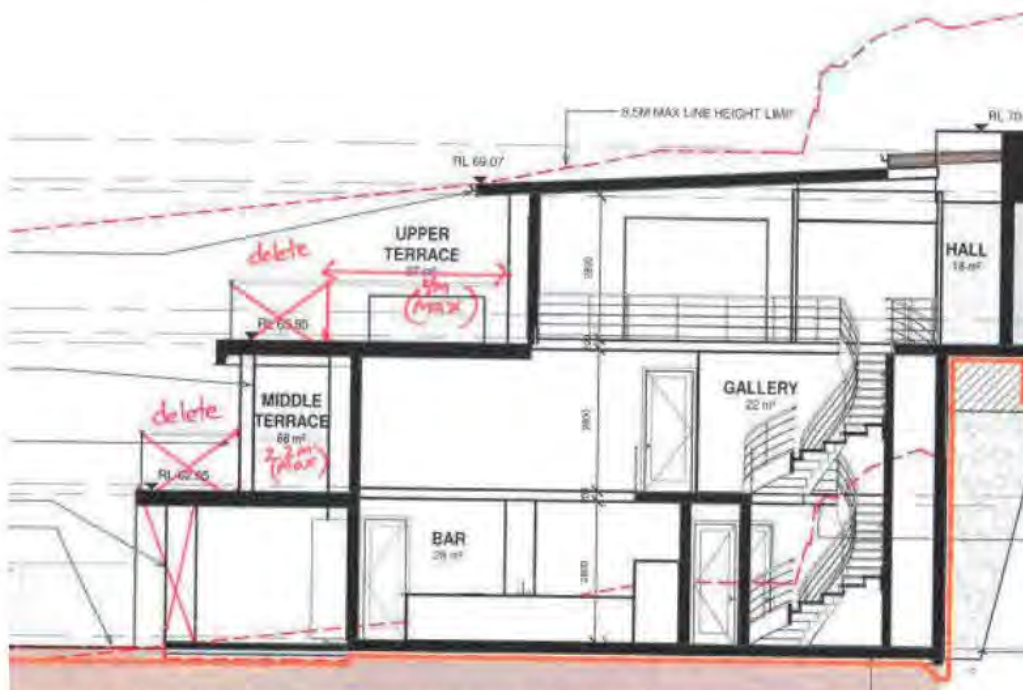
Sketch plan indicating recommended amendments to upper and mid level terraces
